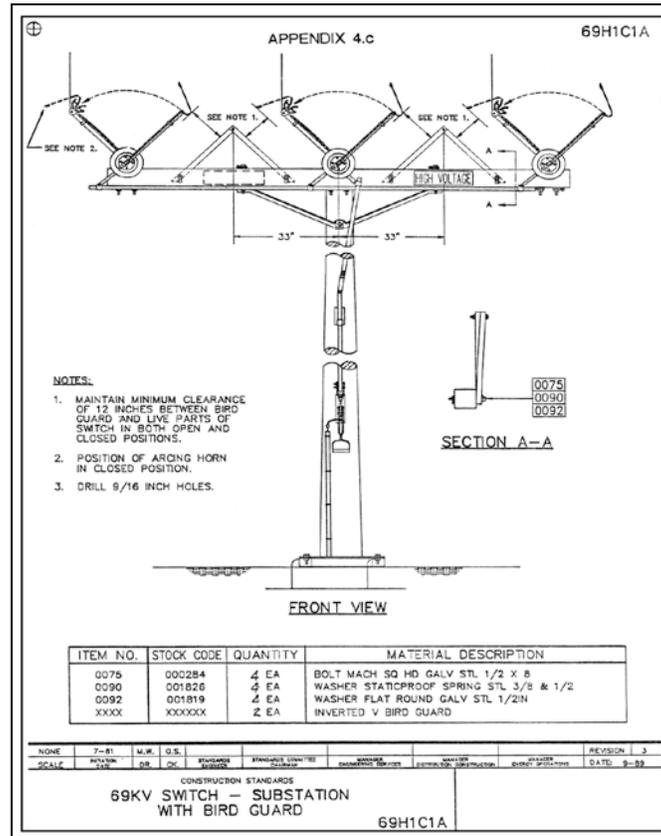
Bird guard installation and switch design (SMUD 1989)
